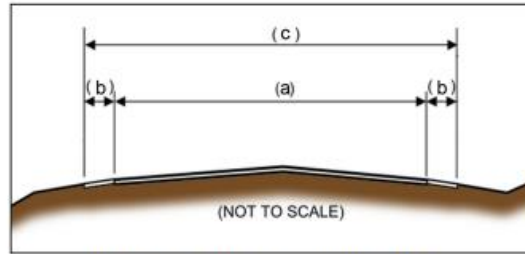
Cross Section Profile –Curbed Residential Access Street
